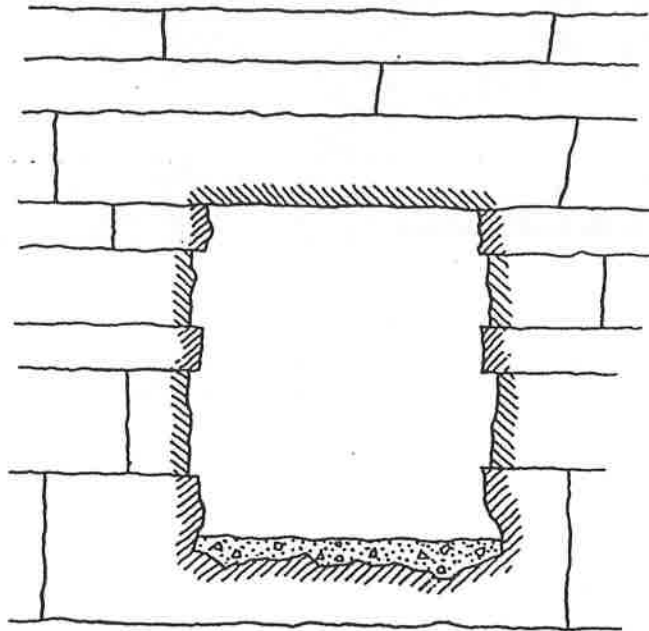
b Bridge action in rocks with widely spaced transverse joints.
